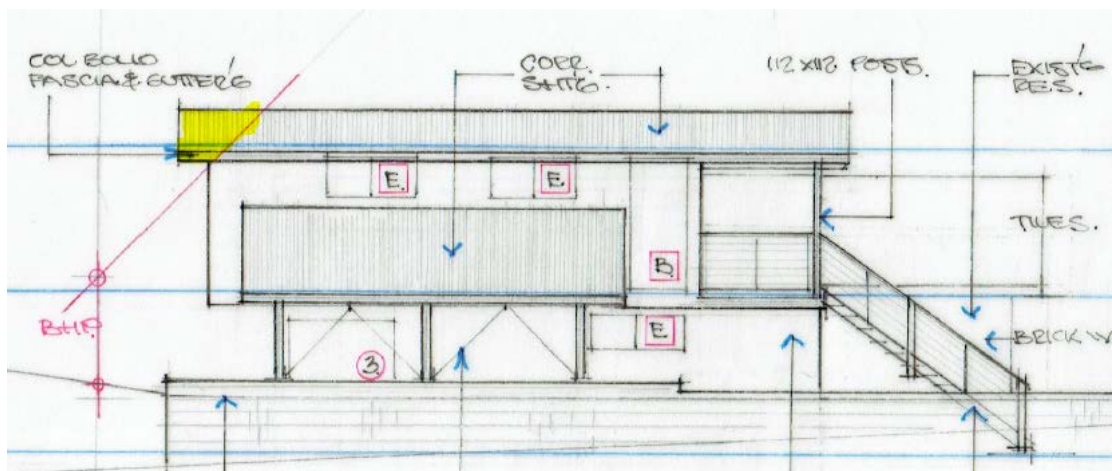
Eastern elevation showing building height plane encroachment (Brunswick Heads Building Designers)
